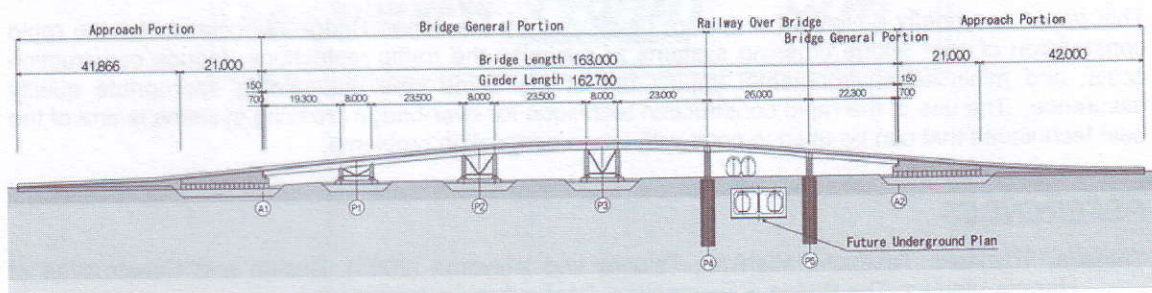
General details of Chofu-Tsurukawa Over-Bridge
